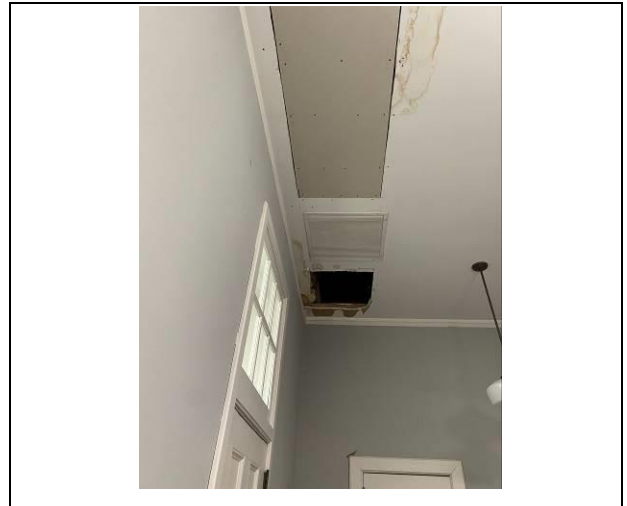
Water Damage from Initial Water Intrusion on Second Floor
